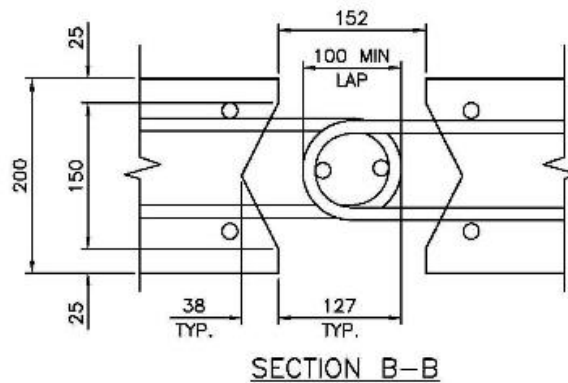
End view of the UHPC joint fill between precast deck panels at the abutment
